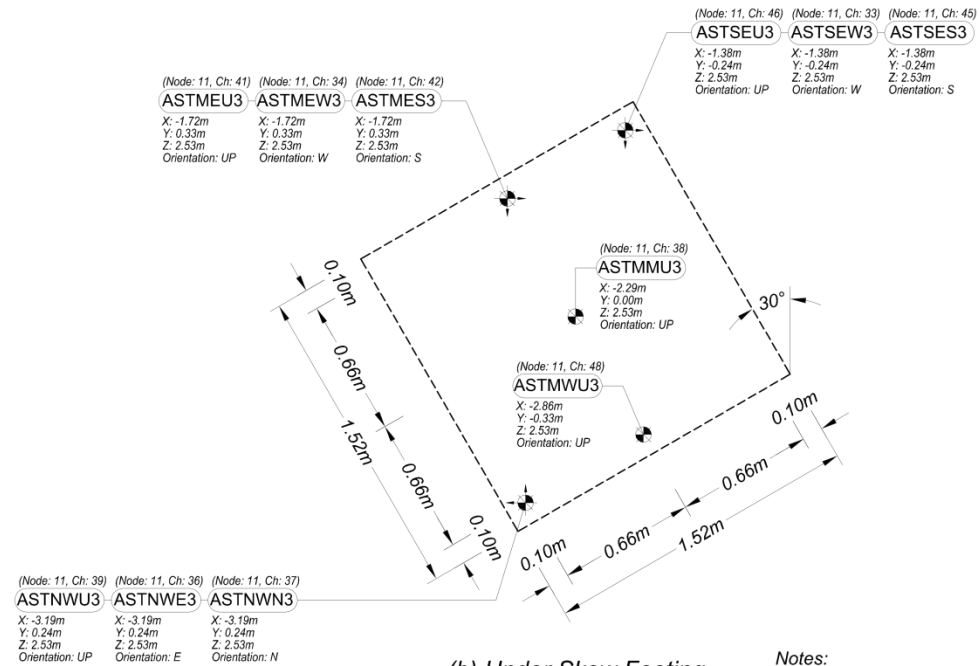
General plan view of accelerometers placed in the soil under the footings at EL+2.49m.
